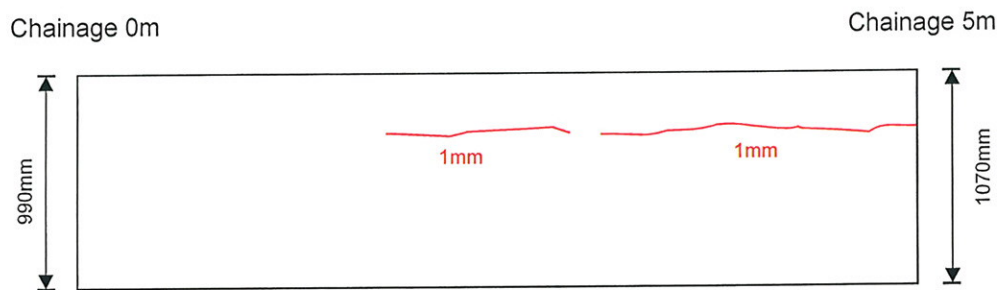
Wall Height, Crack Locations and Sizes for Chainages 0m to 5m
